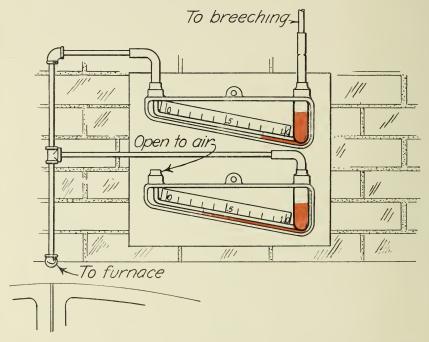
Sketch Showing the Correct Method of Connecting Draft Gages
